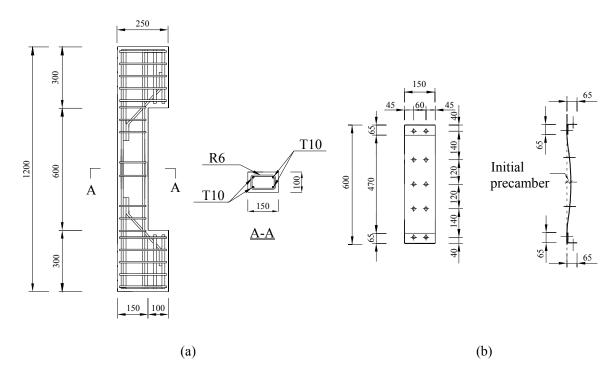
Reinforcement and precambered steel plates; (a) RC details; (b) Steel plate details
